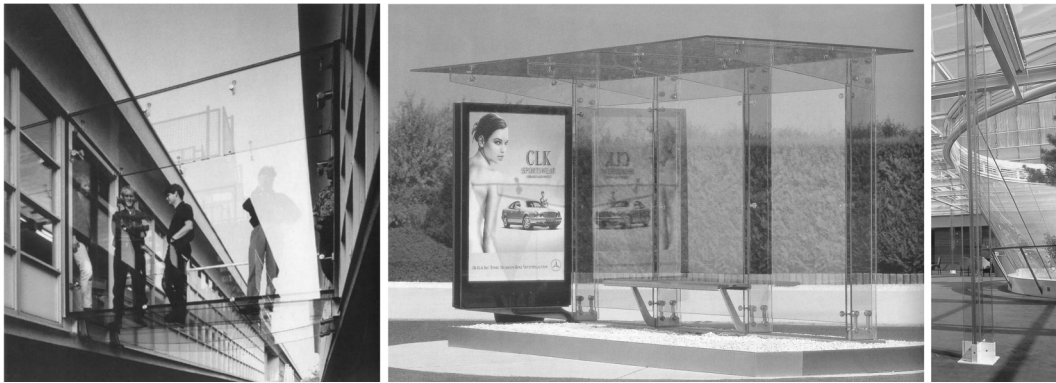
Examples in Europe: Pedestrian Bridge, Bus Shelter, Roof supporting Column
